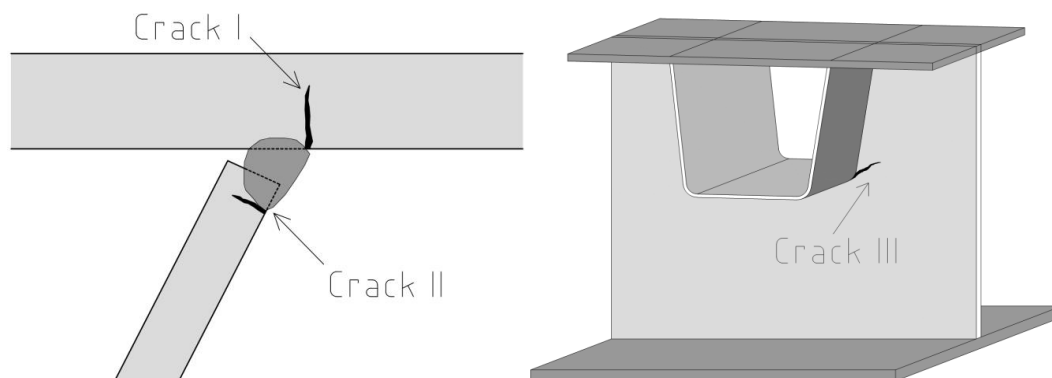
The three investigated cracks (a) Crack I and II at the rib-to-deck plate weld; (b) Crack III at the radii of the rib-to-floor beam weld.
